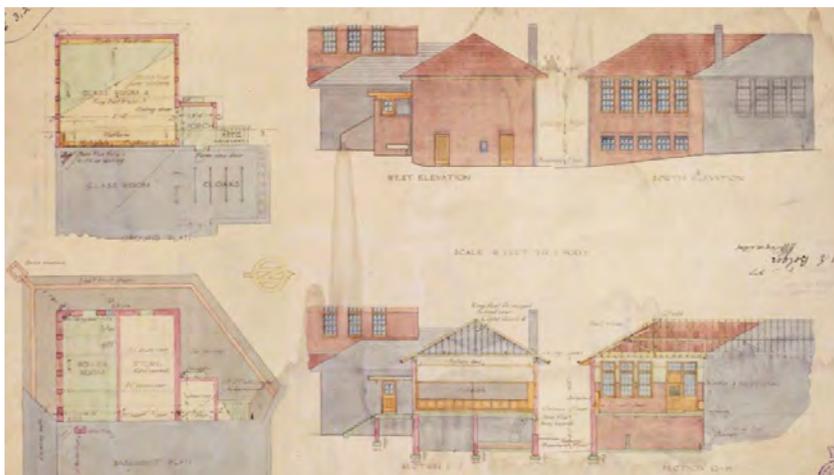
Building plan for the 1938 additions (PROV VPRS 3686/P6/4019)
